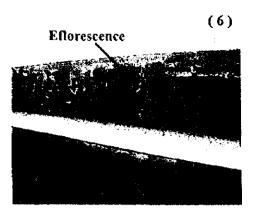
shows a sample of this damage on underside of the cantilever slab of Confluencia Bridge.
